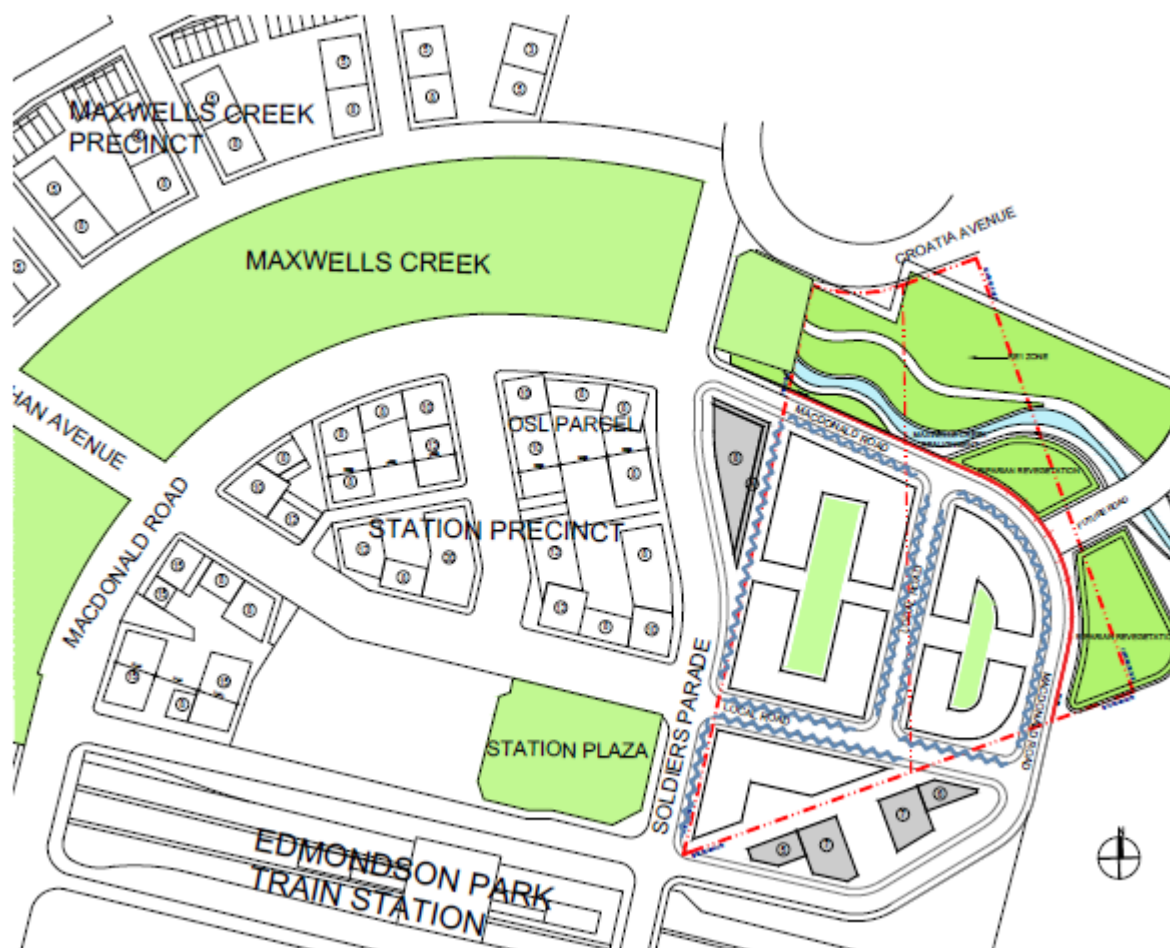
Staging Diagram (Source: Tony Owen Partners, April 2021)
